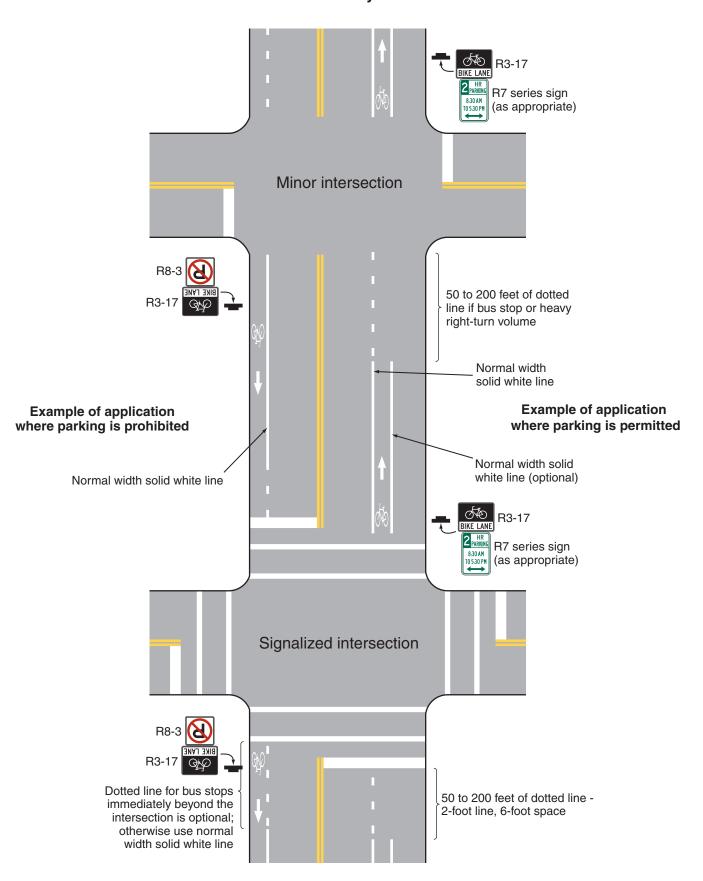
C-6. Example of Pavement Markings for Bicycle Lanes on a Two-Way Street
